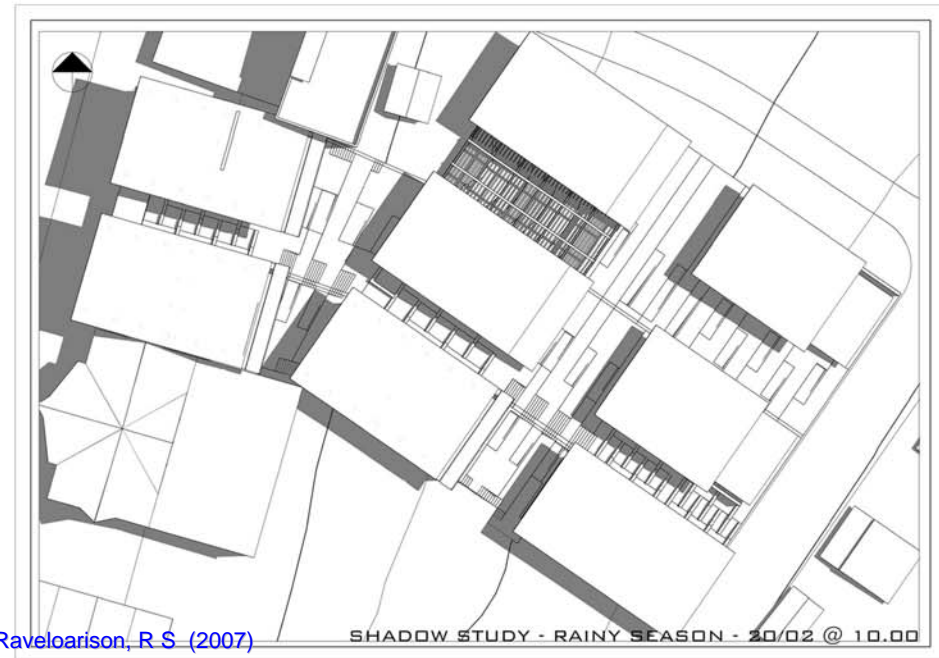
SHADOW STUDY ON 20 FEBRUARY AT 10.00 - SITE PLAN (AUTHOR, 2006).
